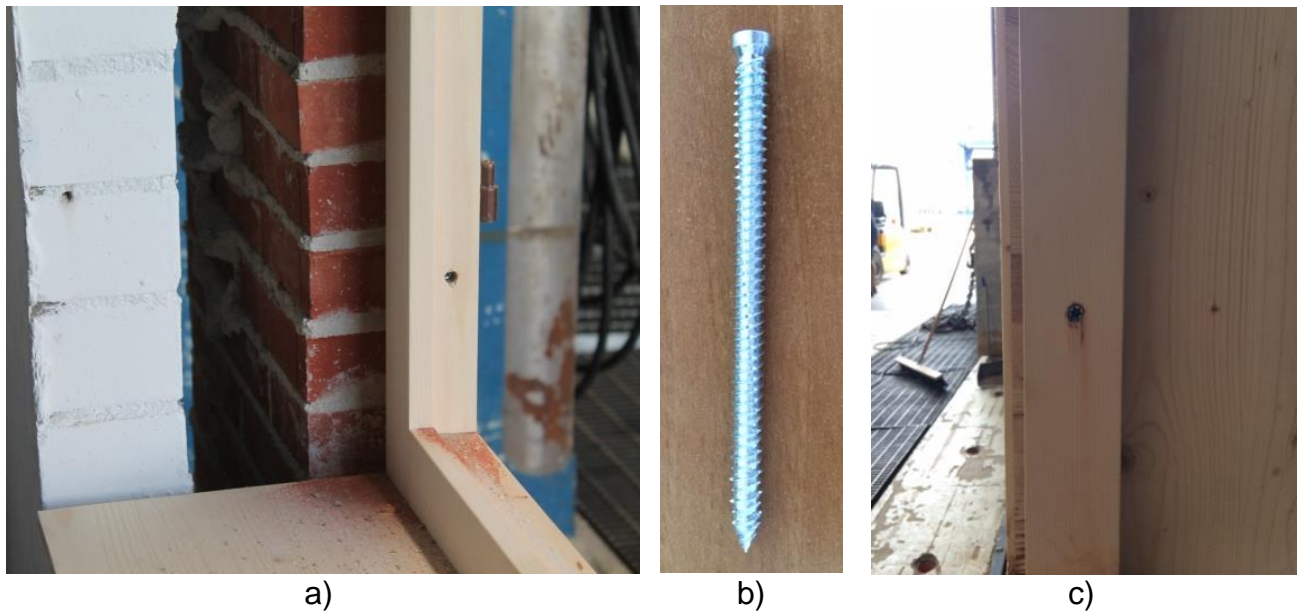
Window frame-to-clay masonry leaf connections: a) during construction, without side cover plates; b) screw; c) at the end of construction, with side cover plates.
